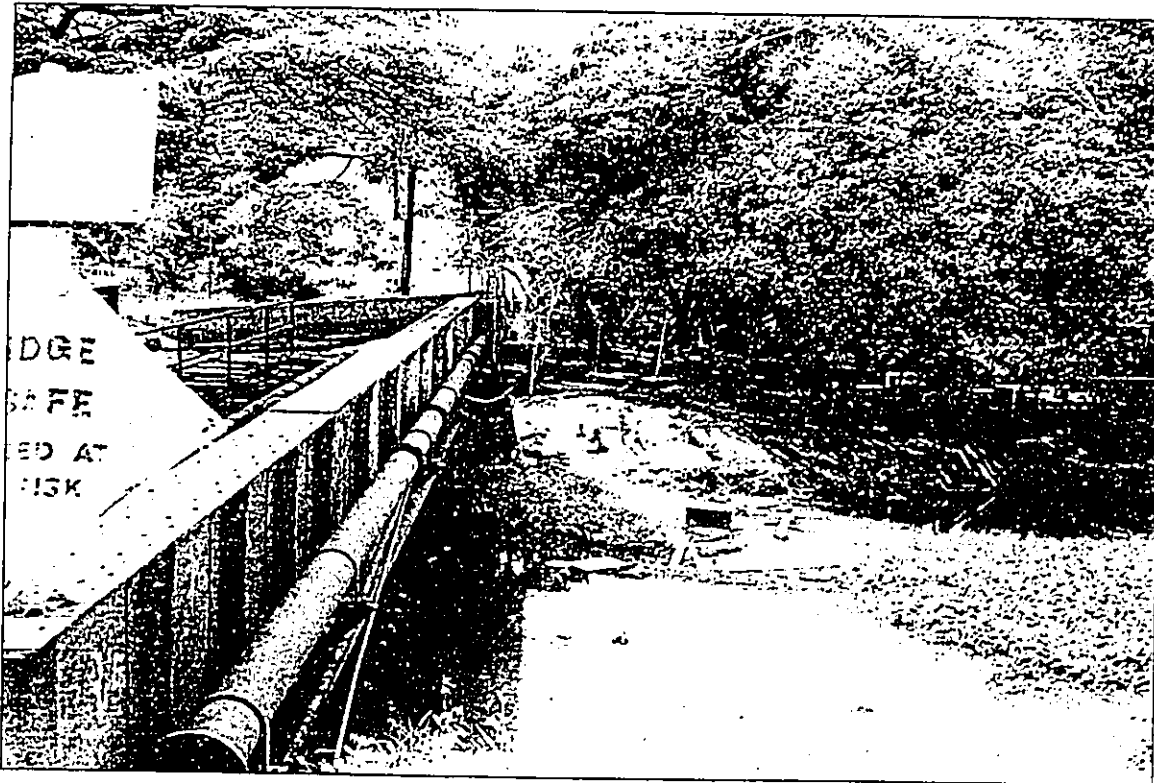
Kapakahi Stream crossing at Waipahu Depot Road, view of the makai side. Note the trash and debris in the water.
